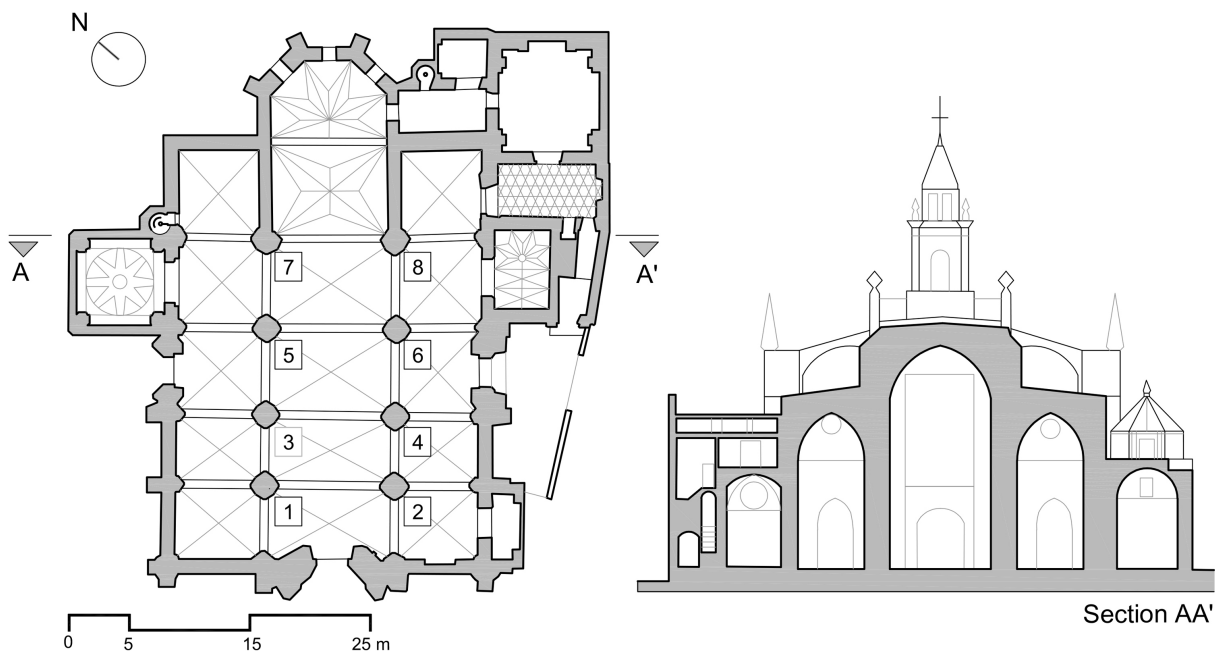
Santiago Church: Plant and cross section (See also Figure 1-a).
